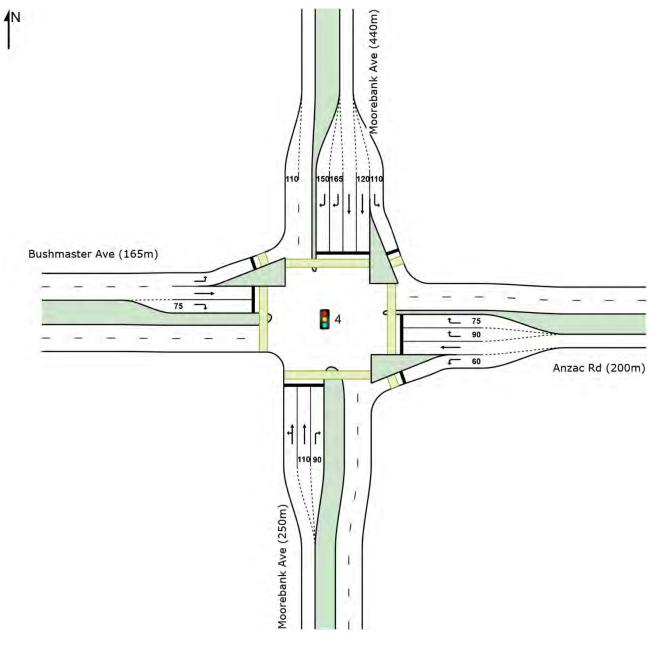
SIDRA Layout - Proposed Construction Access - Phase 4
